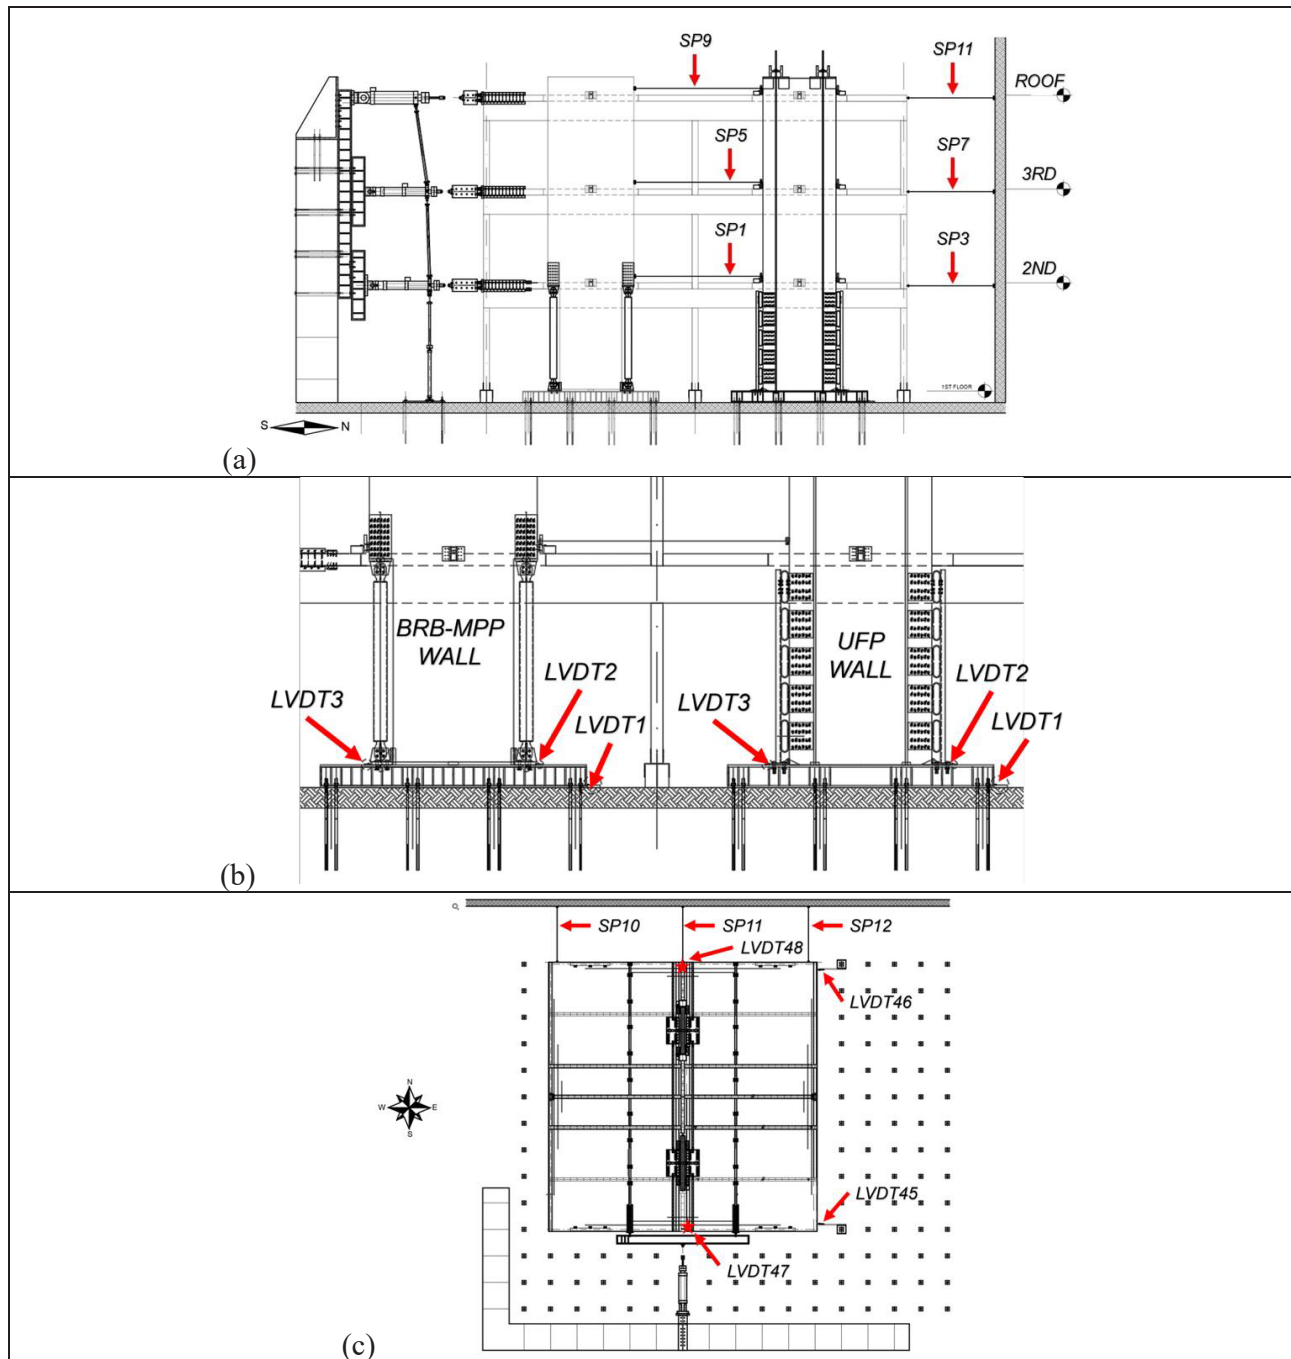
Instrumentation arrangements for observation of global building behavior: (a) string potentiometers for story and wall displacement; (b) LVDTs measuring beam foundation and wall sliding; and (c) string potentiometers LVDTs measuring torsion and out-of-plane movement at the roof.
